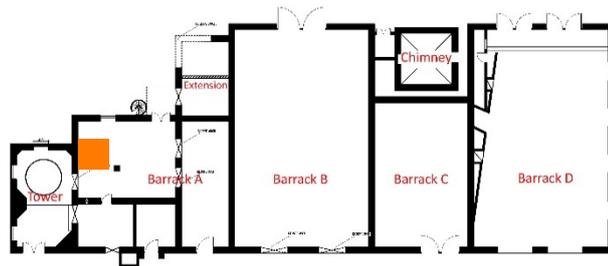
Plan - Paint over Surface - Barrack A, 15 to 17A, East Wharf, KPT, Karachi.
